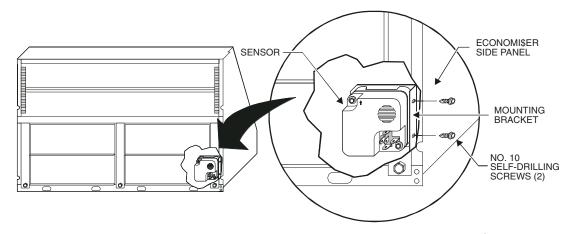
Mounting the Sensor and Bracket in a 3 to 6 Ton Vertical EconoMi\$er Assembly
